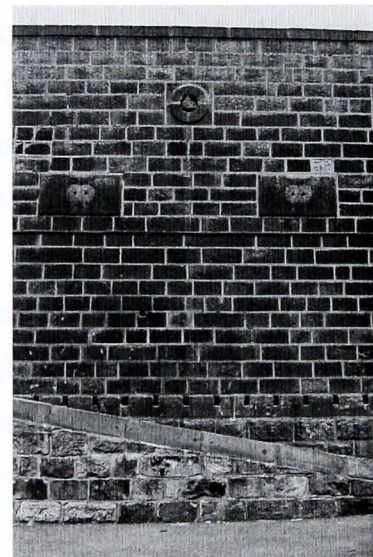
The main horizontal shaft at Pecket Well Shed, Wadsworth was supported by heavy brackets bolted through the exterior wall
